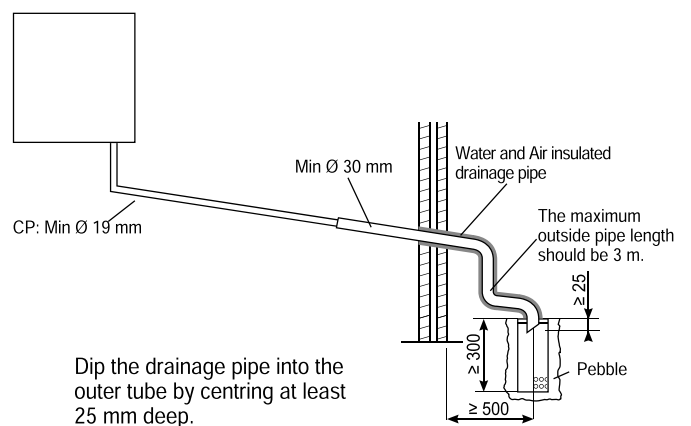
Connection of Condensing Water Drainage Pipe on Exterior Environment
